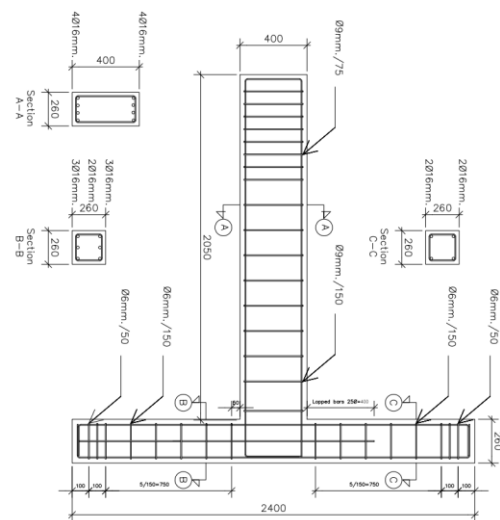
Details of reinforcement in the example of the beam-column connection point reinforced concrete.
